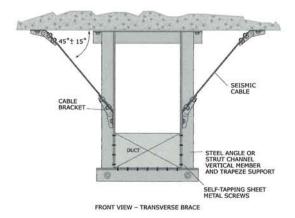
Rectangular duct with steel shapes and braced with cables (transverse).
